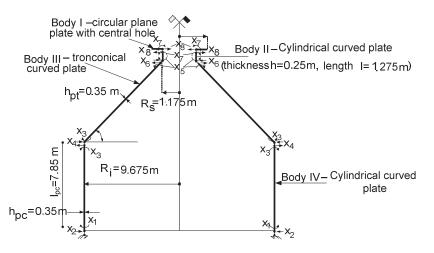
Basic system of the structural part cylindrical wall - tank roof
